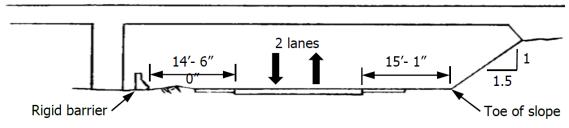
Bridge elevation view of a 2-lane, 2-way highway feature below the bridge, with a rigid barrier.
